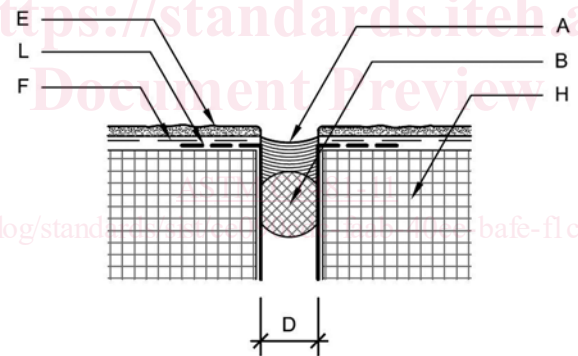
Sealant Butt Joint Seal (Accessory to Accessory)
